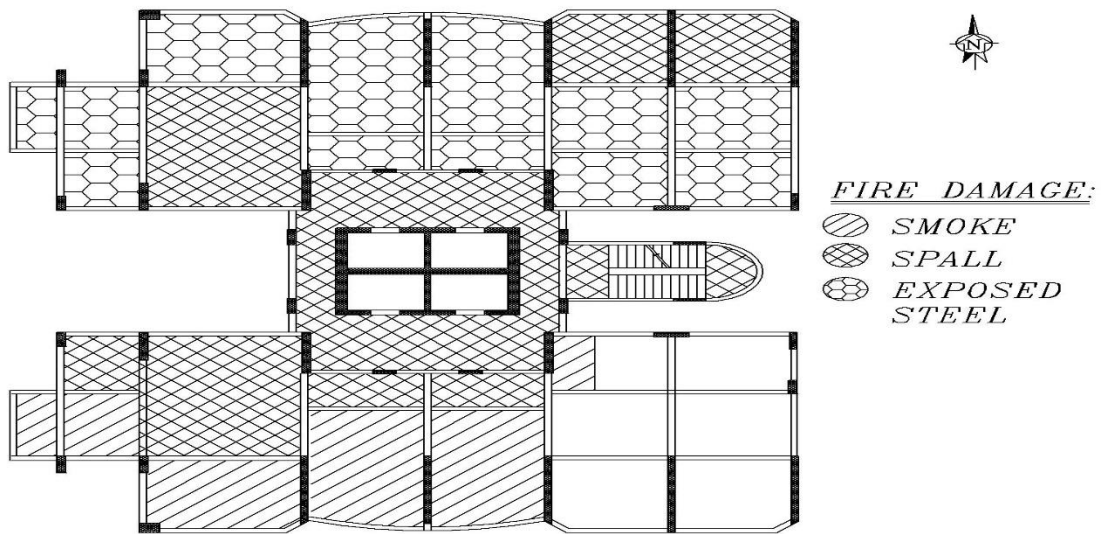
fire damage to 7<sup>th</sup> floor slabs zone2
